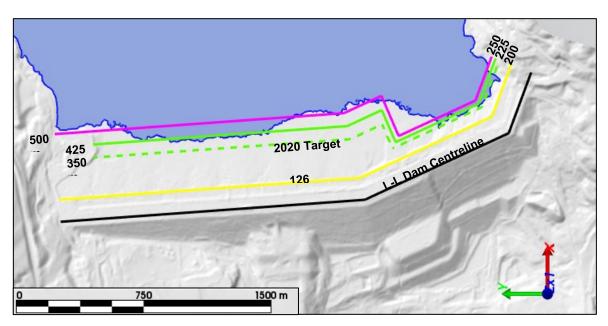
2020 Highland TSF Tailings Pond Elevations and Estimated Pond Volumes
